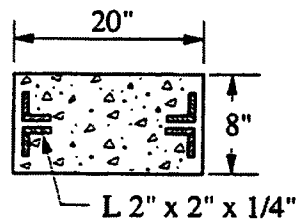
Bridge I: Configuration and reinforcing details of hangers.
